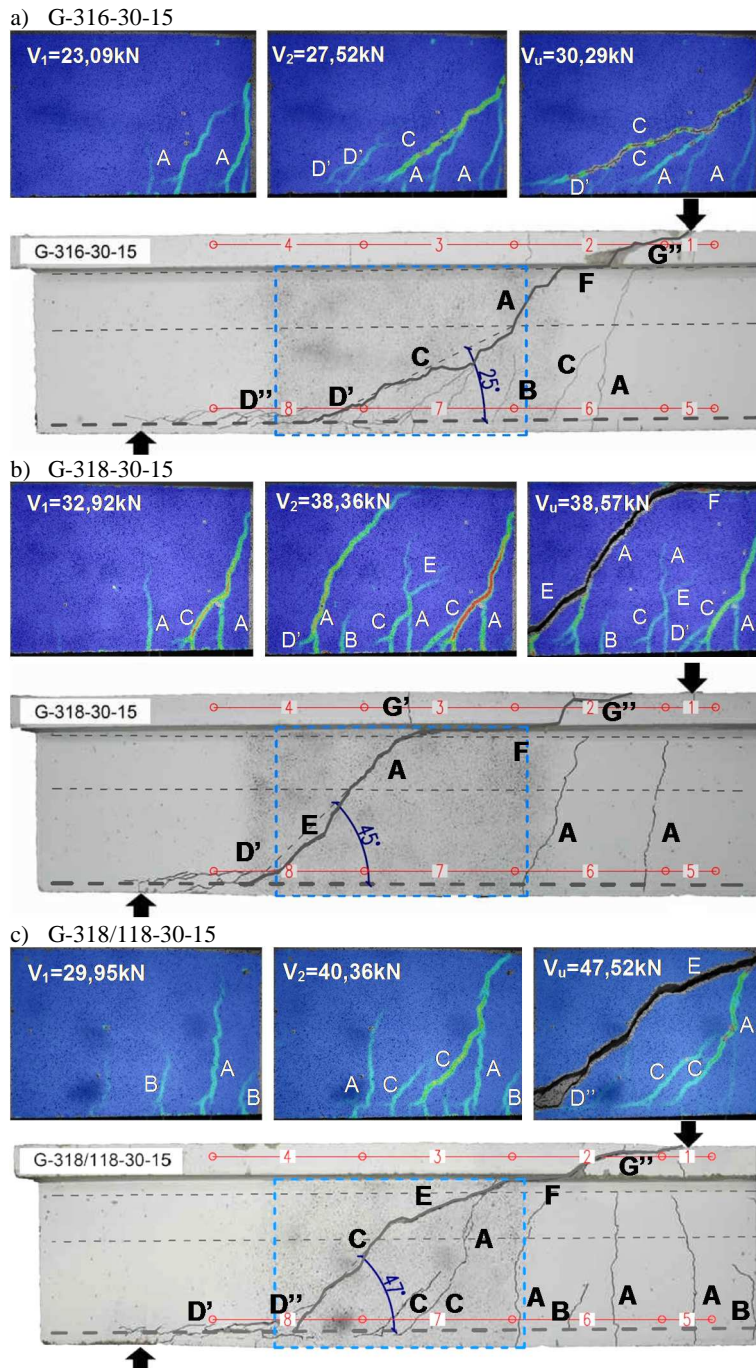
Type of cracks in steel reinforced elements without stirrups according to [1]
